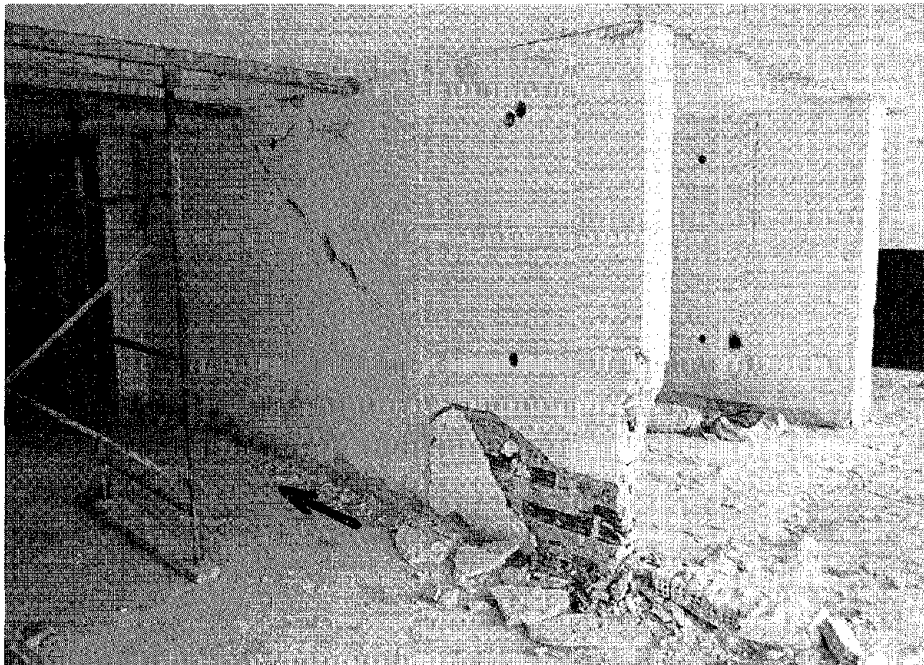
Galaxy Hotel in Vrahati. West view of the first story. The cracked walls are directed southwest to northeast.
